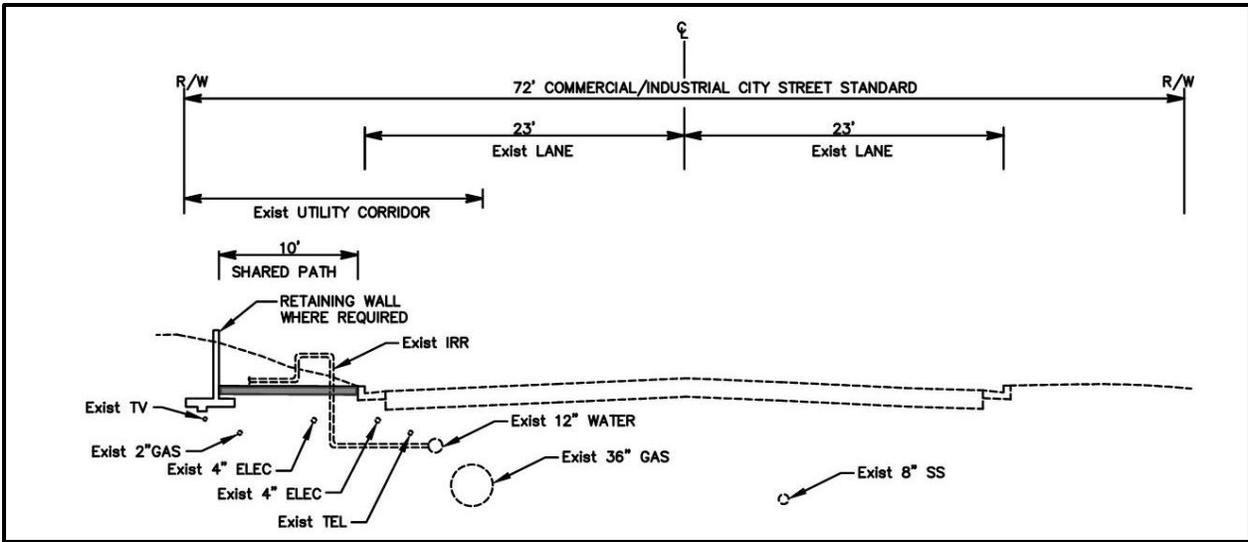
Brandin Court Proposed Roadway Section (Facing West)
